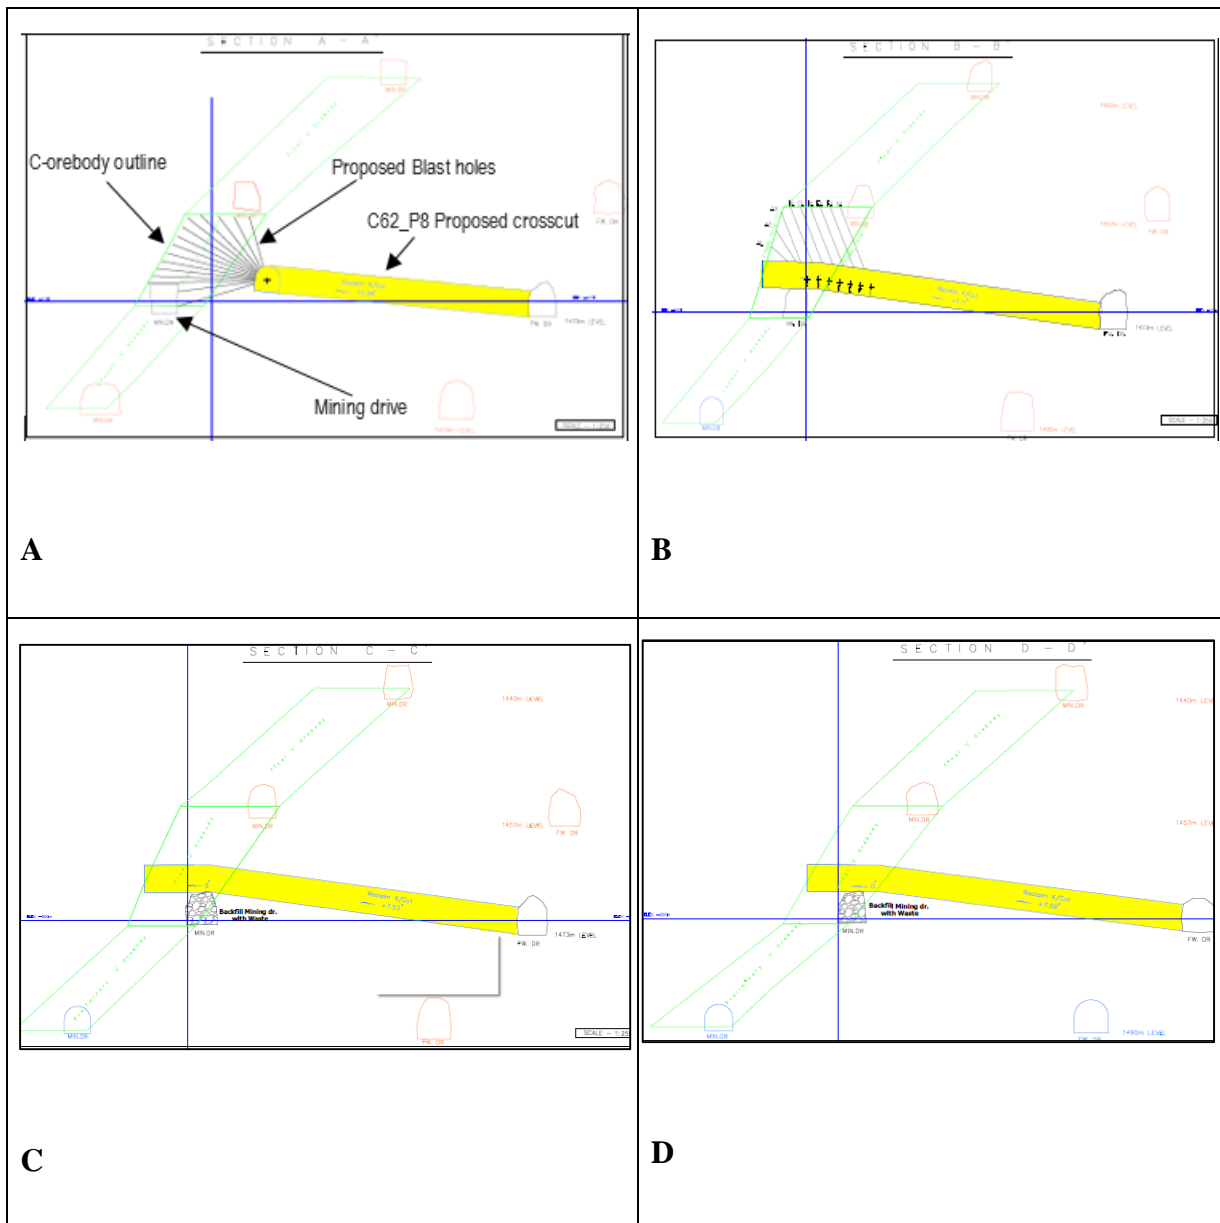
1. (A) Cross-section 62P8 proposed cross-cut layout, (B) Cross-section 63P2 proposed cross-cut layout, (C) Cross-section 63P7 proposed cross-cut layout and (D) Cross-section 63P8 proposed cross-cut layout
